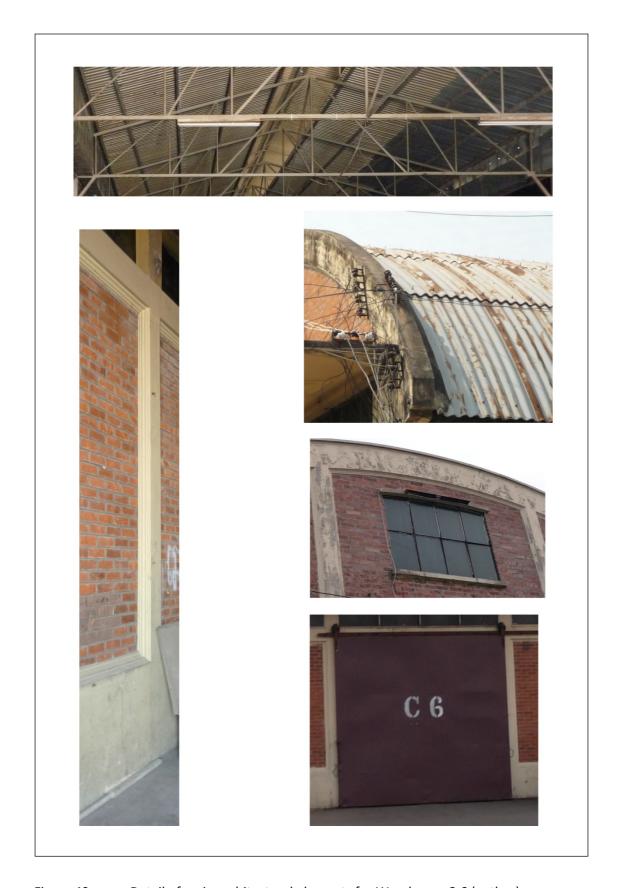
Detail of main architectural elements for Warehouse C-6 (author)
